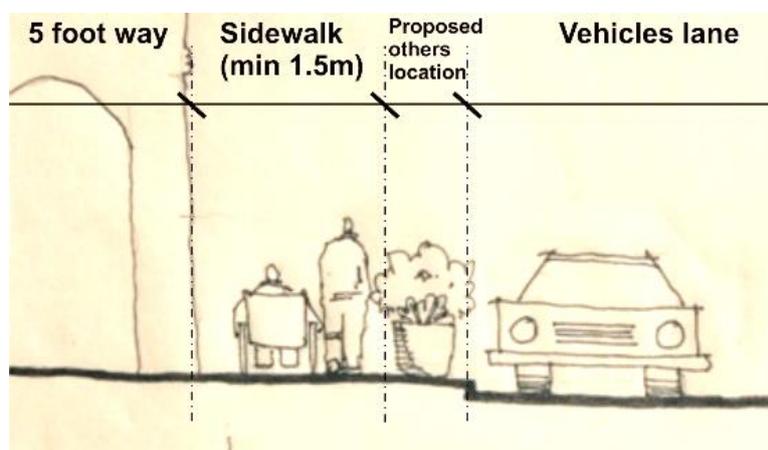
Minimum 1.5m width of sidewalk without any obstacle
